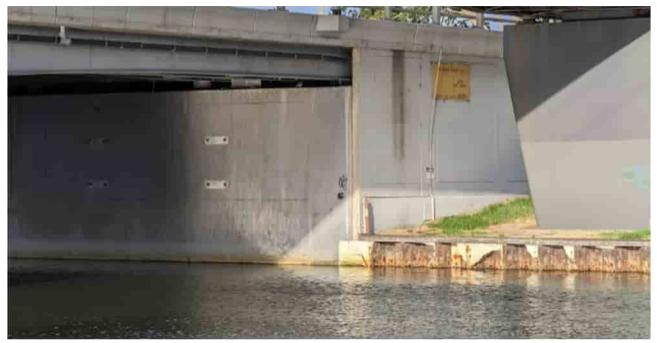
Footscray Road bridge from the western bank, facing east where the downstream 'training wall' is visible (photo taken in 2023).
